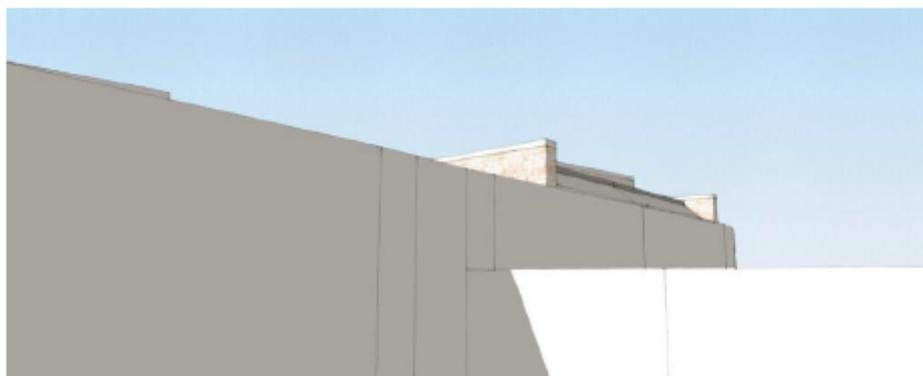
Proposed illustrative view from rear of Lambton Road (Taken from Design & Access Statement prepared by Create Design + Architecture).
